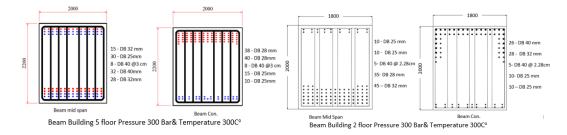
Designs of the beams' cross-sectional areas and the reinforced steel bar.
